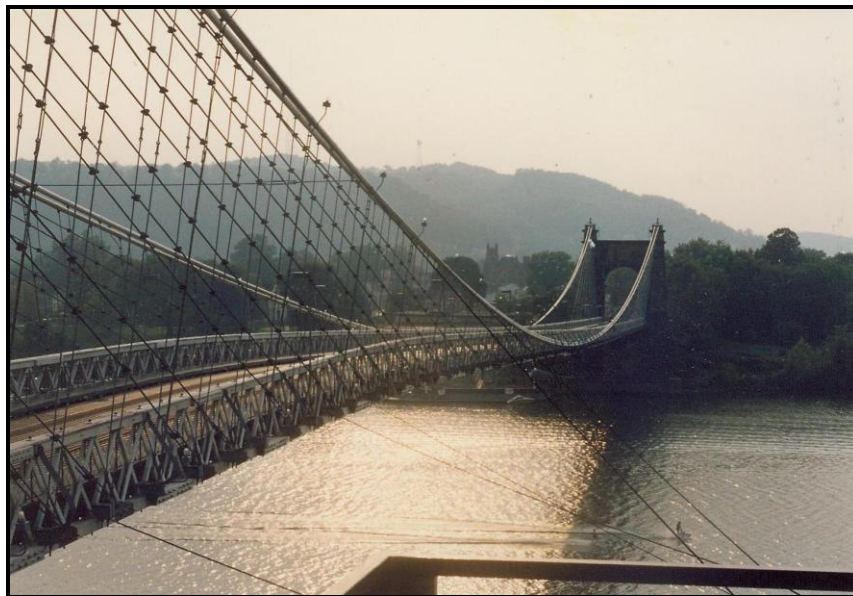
Wheeling Suspension Bridge (Bridge 35-251/00-000.06) in Ohio County, constructed in 1849, illustrating a steel suspension bridge (photograph courtesy of West Virginia Division of Highways)
